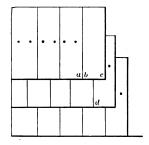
Corner of a Roof Showing How Shingles Are Laid.
